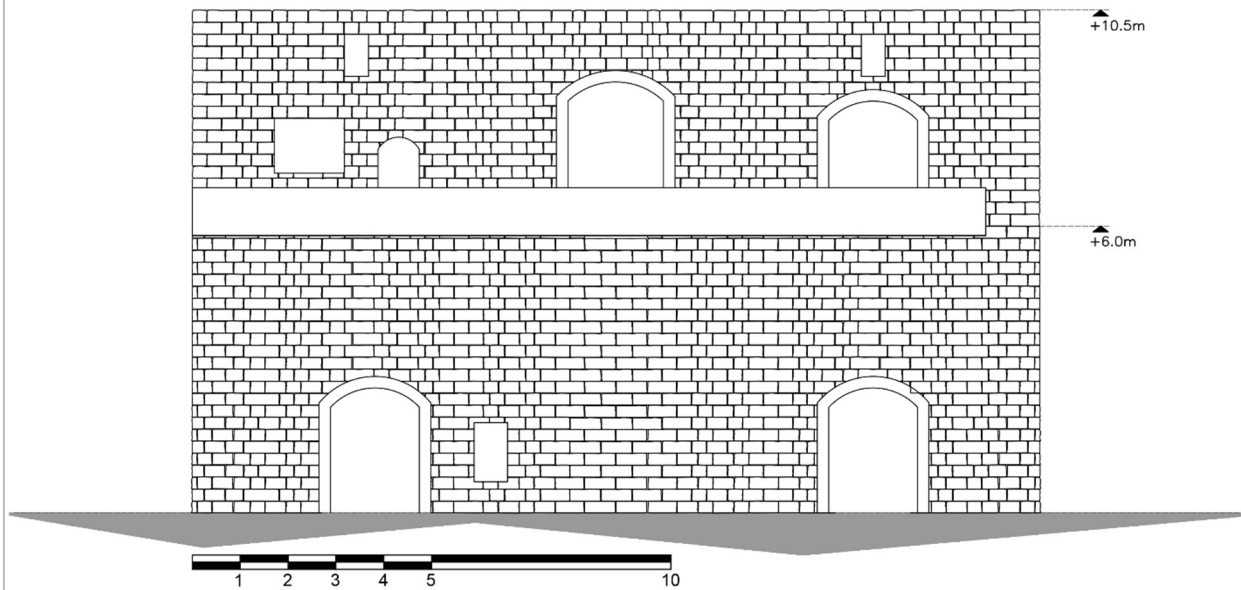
(b): South-West Technical Elevation of Mokhtara Flat Roof Liwan House, Source: Author
